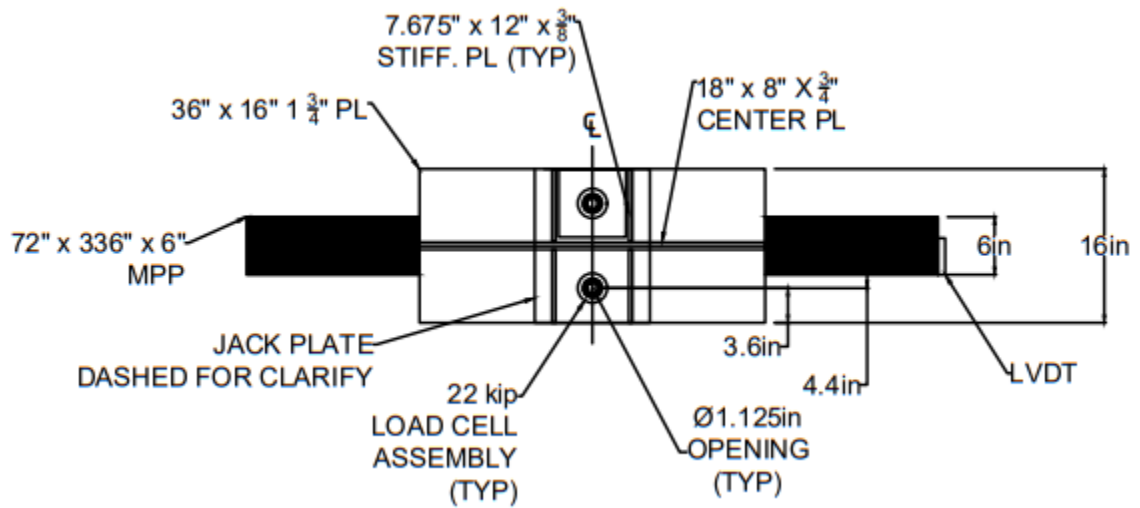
Plan view of MPP wall (credit: E. Baas)
